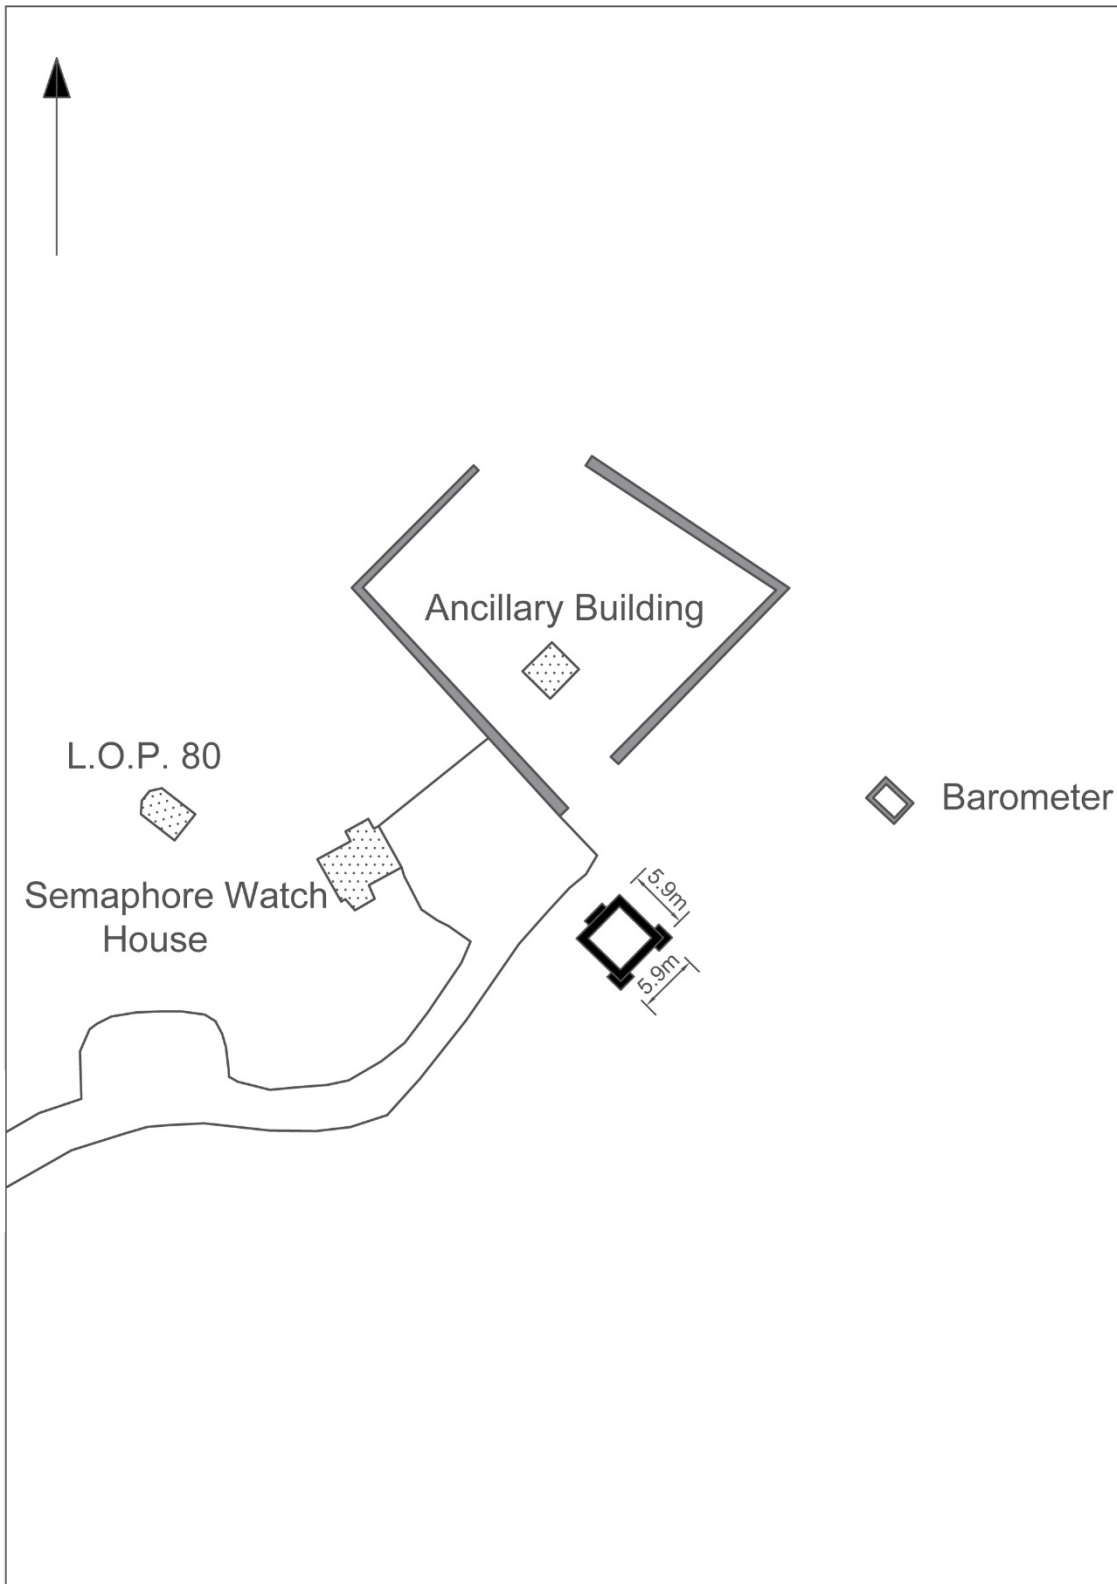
Plan of Malin Head Signal Station and the surrounding buildings.
